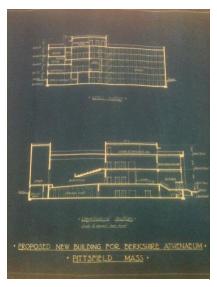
New library proposal, architectural drawing, Alderman and McNeish, 1961. Courtesy Berkshire Athenaeum.
